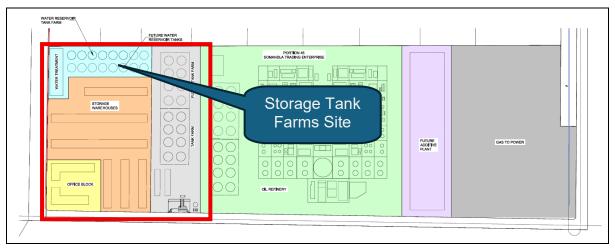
Layout Plan of site (obtained from Seal Consulting Engineers)
